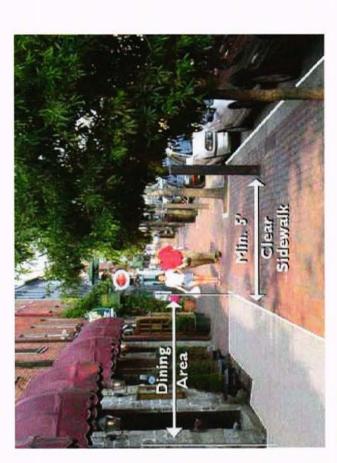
Outdoor dining areas must leave at least 5 feet of unobstructed pedestrian space
